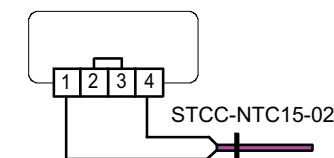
Wiring of floor or duct sensor when using internal setpoint
